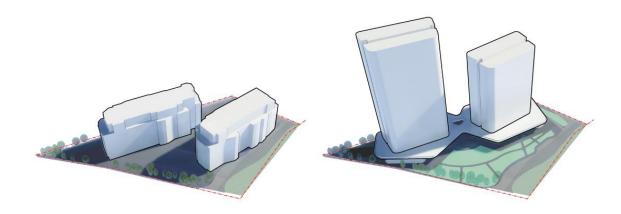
Modulated building form to improve architectural articulation. It was important to give each building a slightly different aesthetic to improve the modulation of the site
